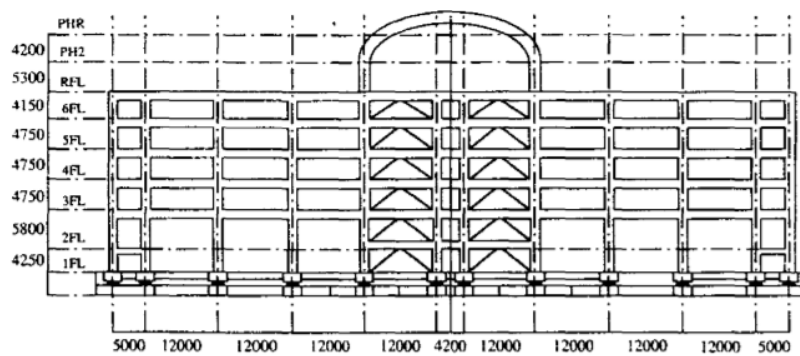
Vertical structural elevation of the base isolated computer center building in Kobe
